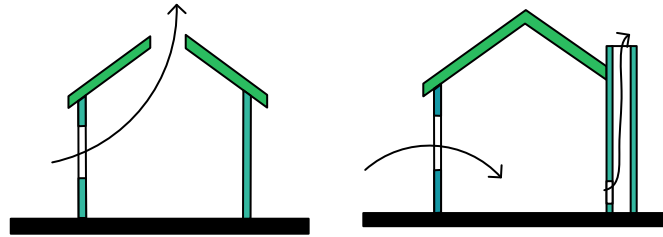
Roof and Chimney Ventilation Retrofit in Residential Buildings
